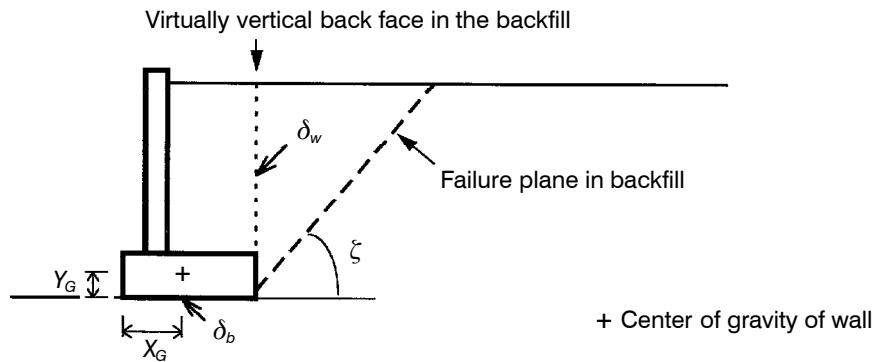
Definition of the failure plane angle, ξ , and the parameters used in Table 3 for the model cantilever-type wall.
